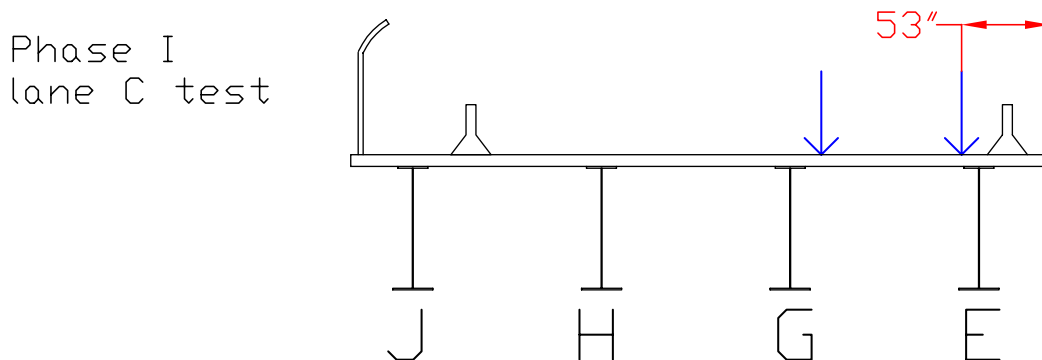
Truck location for Phase I lane C test. Dimensions are to the center of the front wheel
